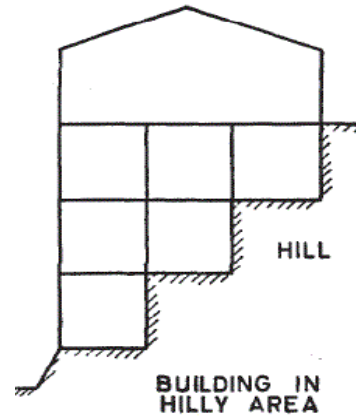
buildings constructed on hilly slopes as per IS: 1893-1984
